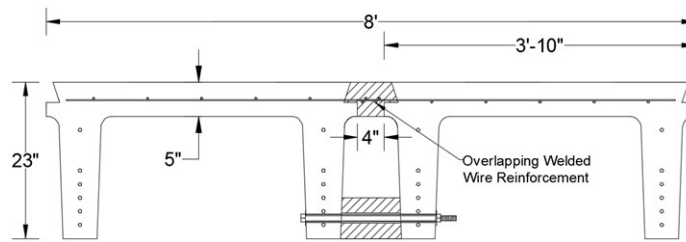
Cross Section of the “Proposed” Specimen (2nd Mesh Not Shown)
